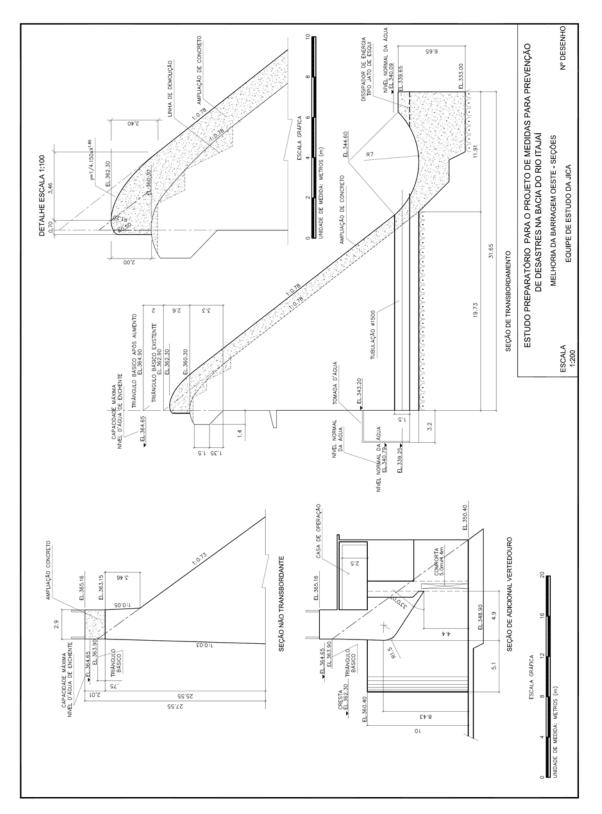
Heigtening of the Oeste Dam and Additional Conduit (2/2)
